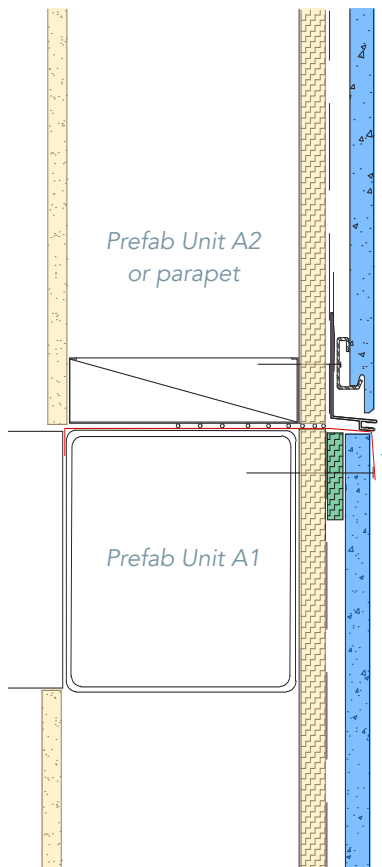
Detail A - Vertical Mate Line - Complete Offsite Pre-Installation
